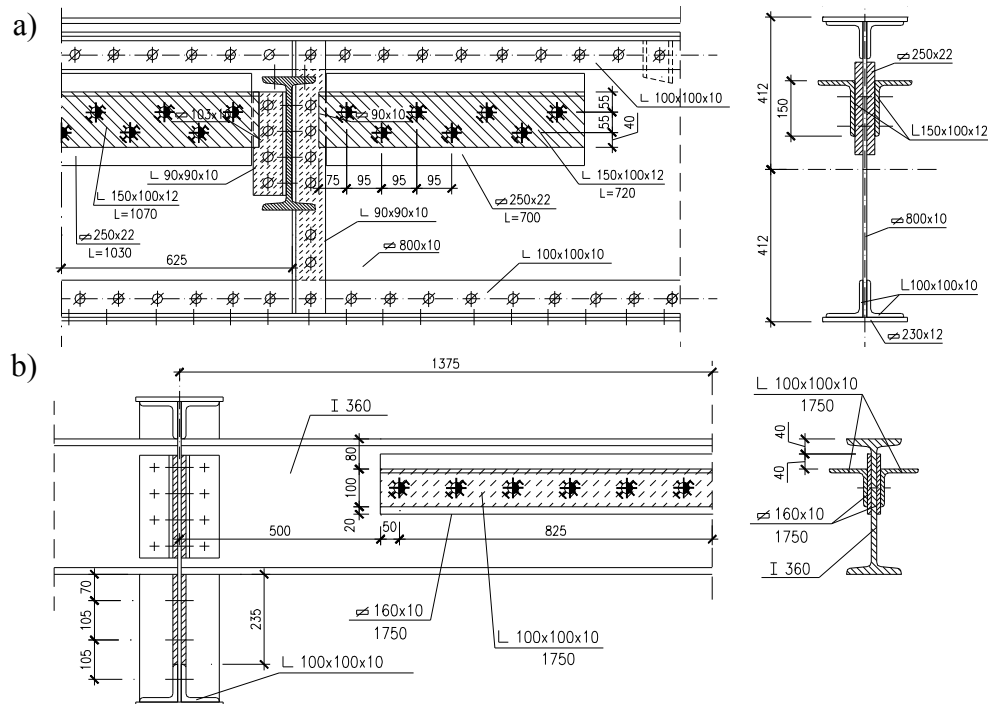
Layout of strengthening: a) crossbeam, b) stringer
